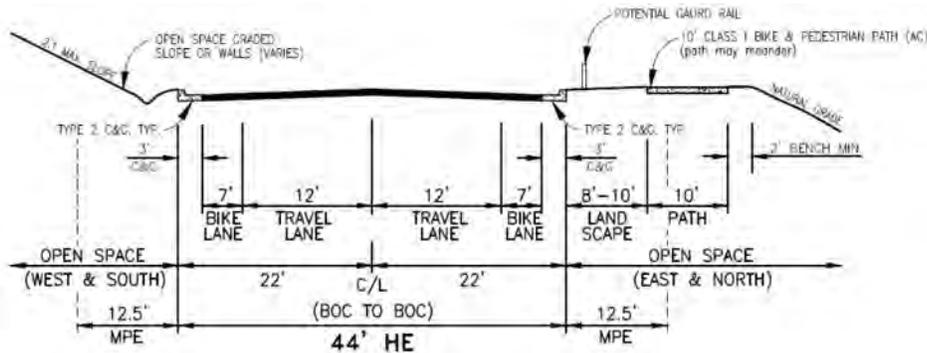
| Bickford Ranch Road – School Ranch Road to Traffic Circle 'A'
